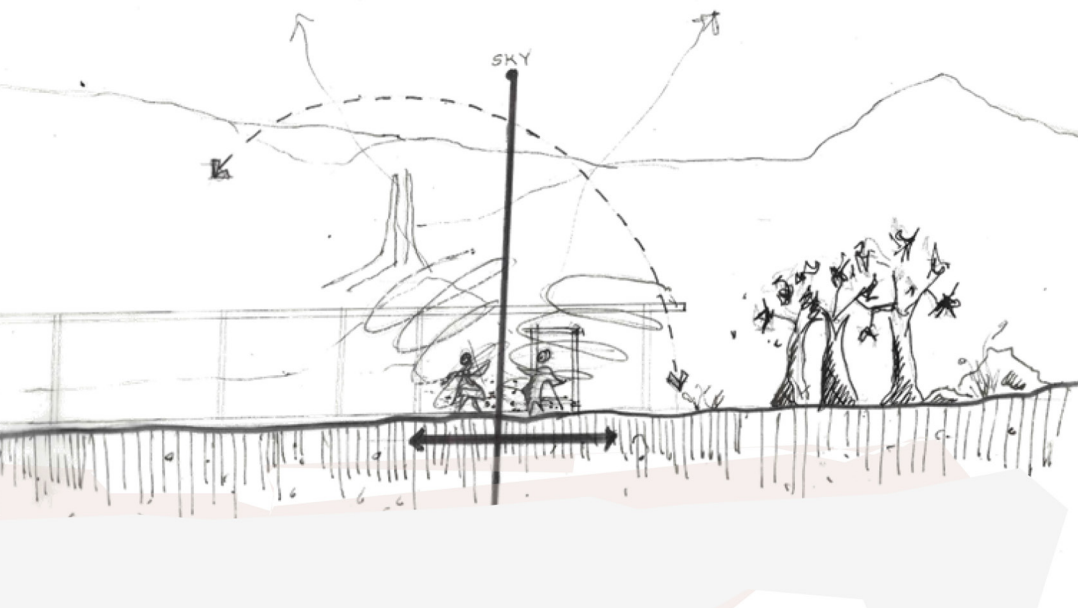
c: Sculpted earth flows from building, weaving into earth
